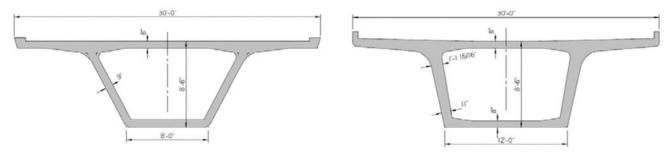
The guideway section on the left shows the optimized precast concrete segment section developed during the design-build refinements. The section on the right is the originally proposed section. The optimized section resulted in a 25% reduction in concrete. Figure: Parsons Corporation and SYSTRA International Bridge Technologies.
